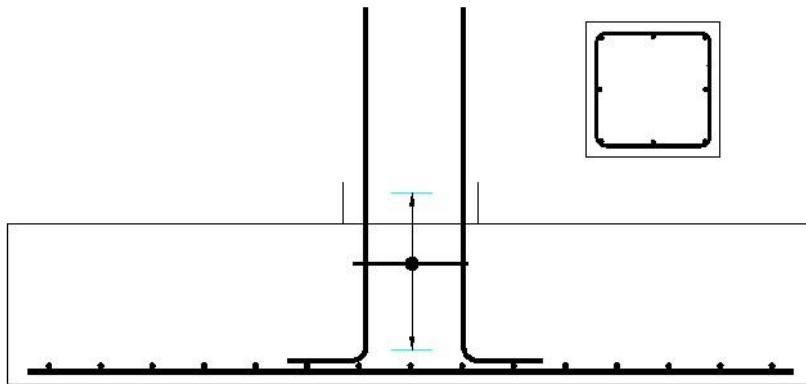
2 Typical Rectangular Column Starter Bar Detail
